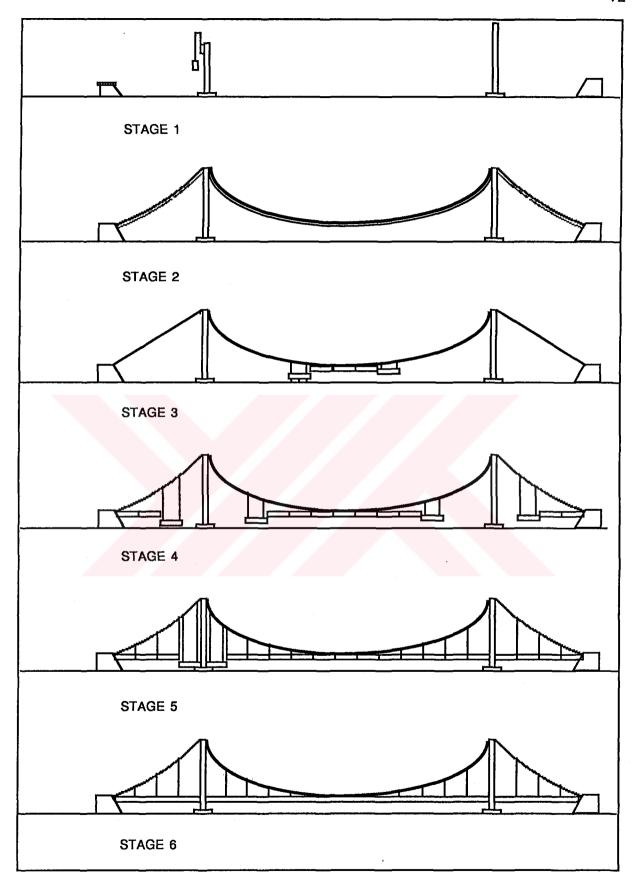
ERECTION FROM MIDSPAN TOWARDS THE PYLONS
